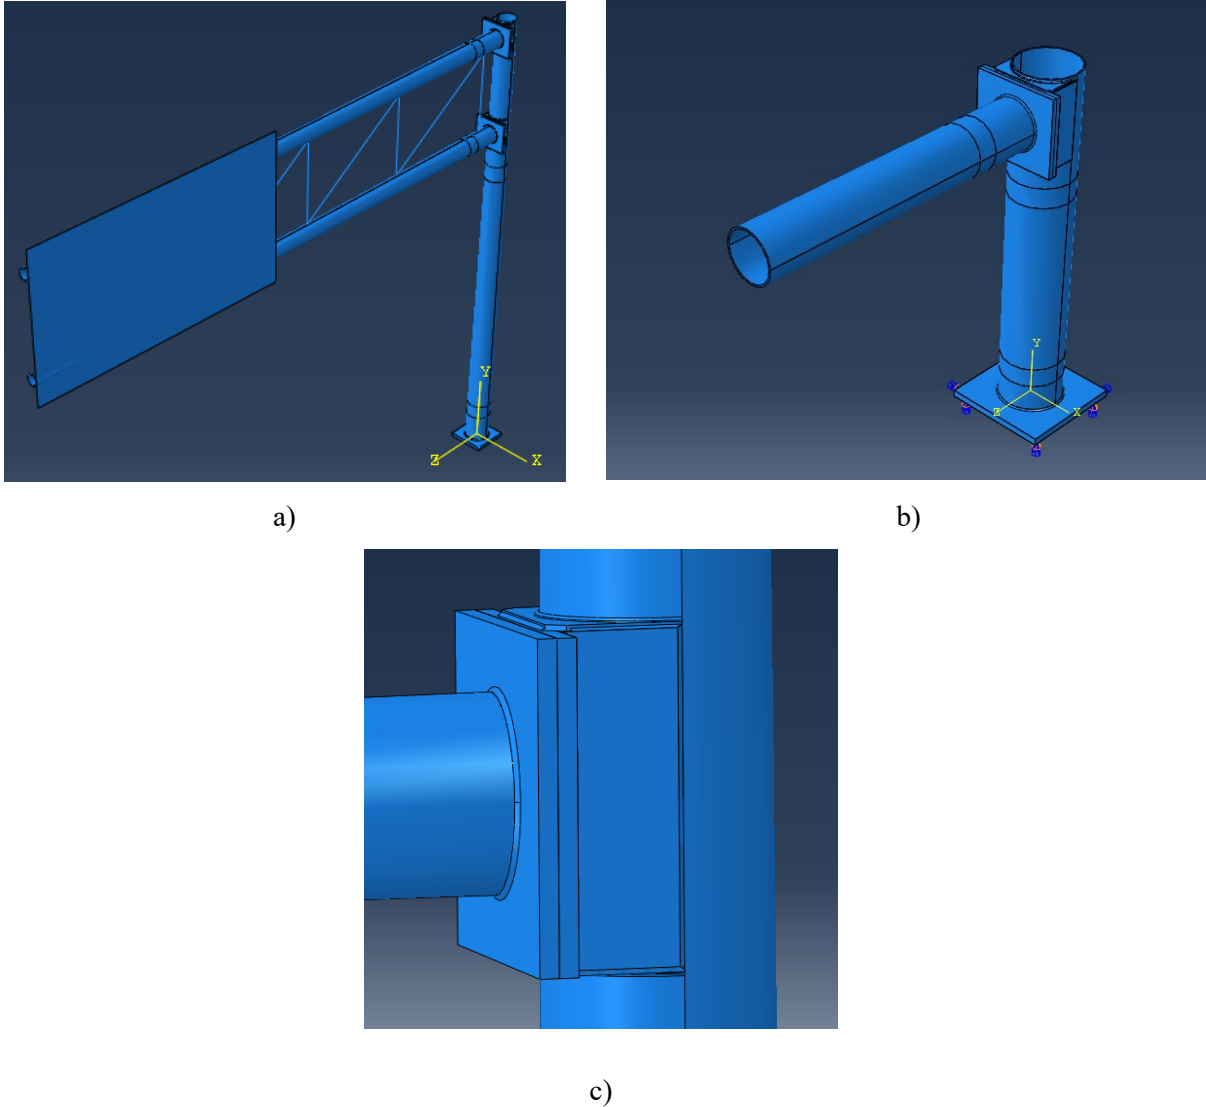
Abaqus Models: a) Full Assembly of tD7L; b) Test Specimen Assembly; c) Bottom Box Connection Assembly
